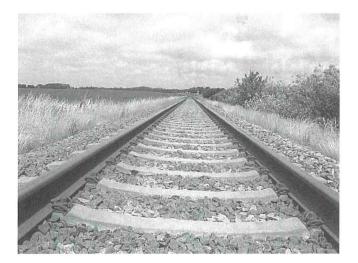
Section of railroad track showing rail, tie, and ballast structure.
